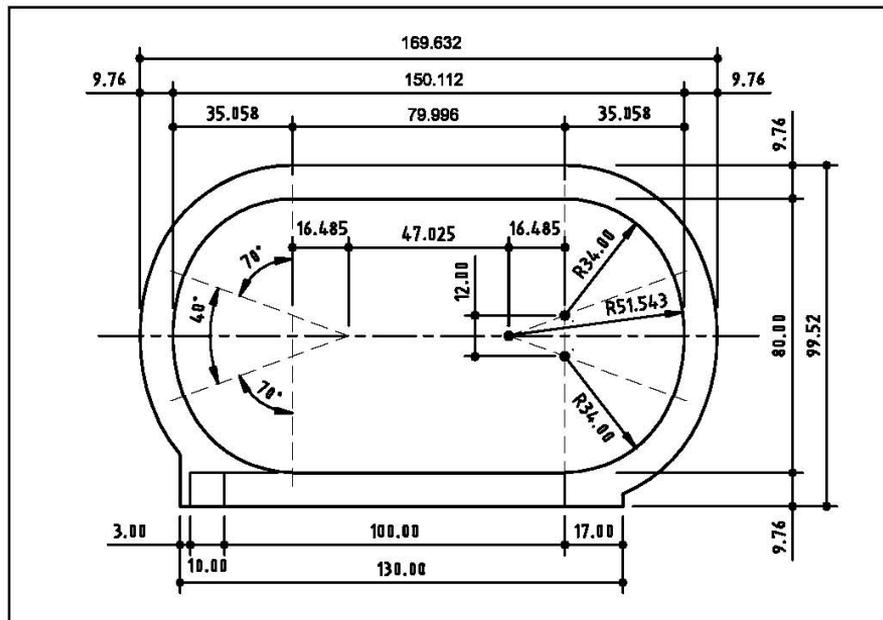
Shape and dimensions of 400m Double Bend Track (Radii 51.543m and 34.00m)
